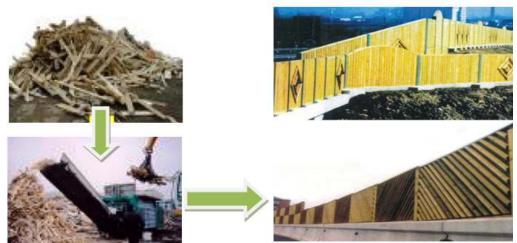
Wood recycling and processing of the street barriers [1, 9, 11]
